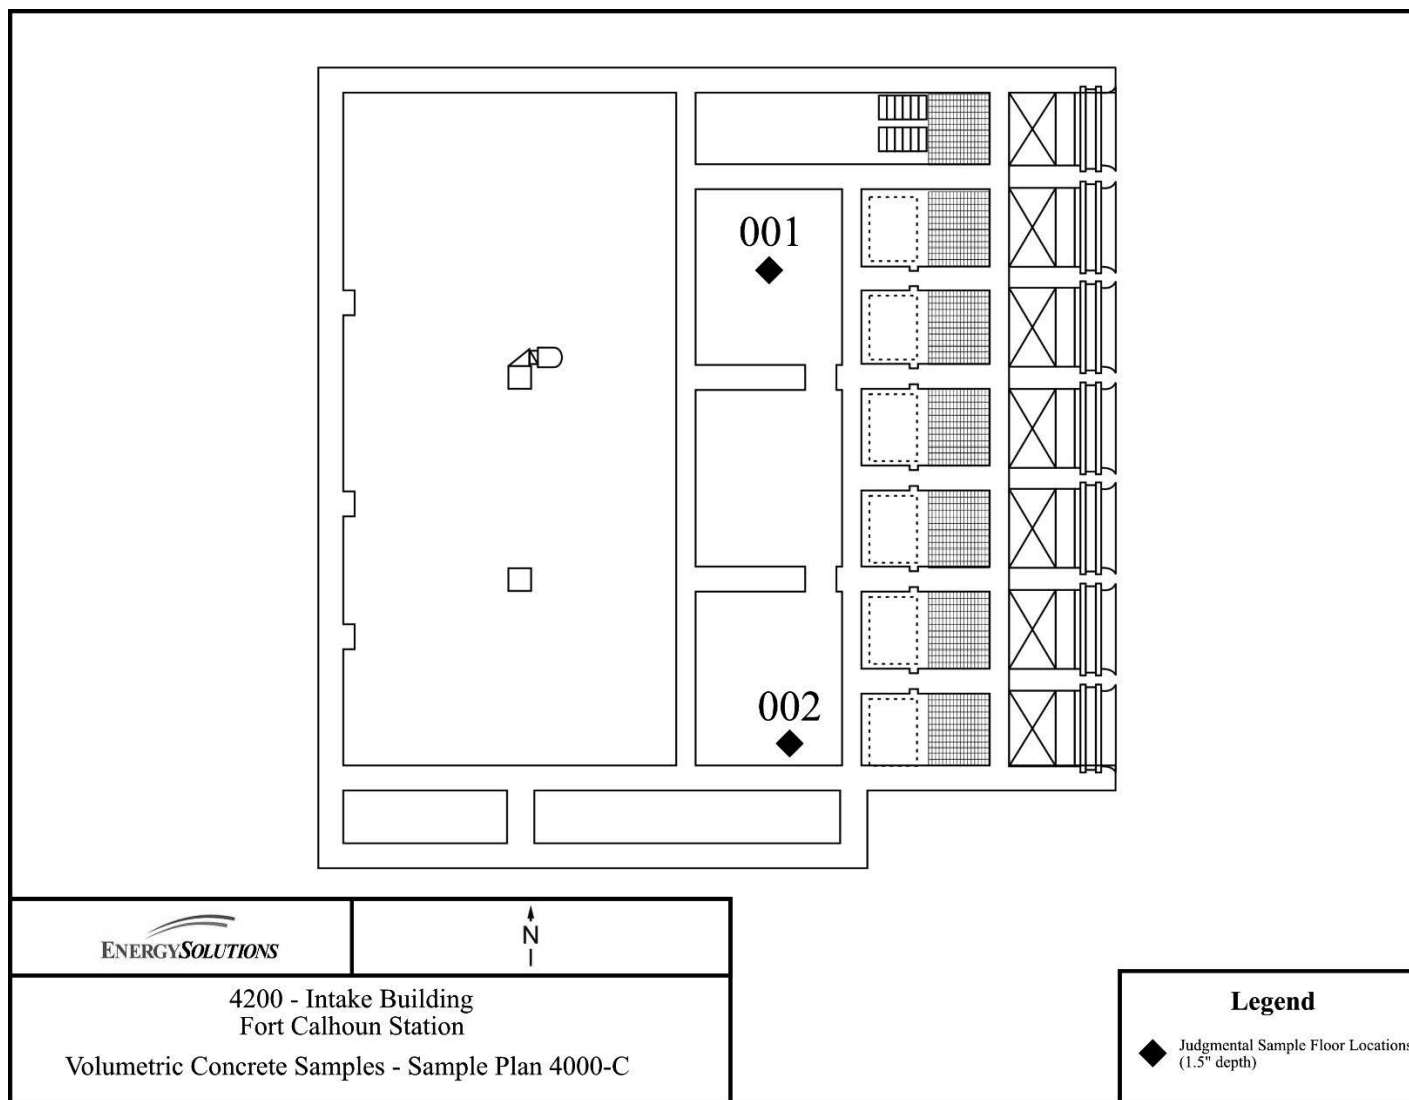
Volumetric Concrete Sample Location in Intake Building Basement
